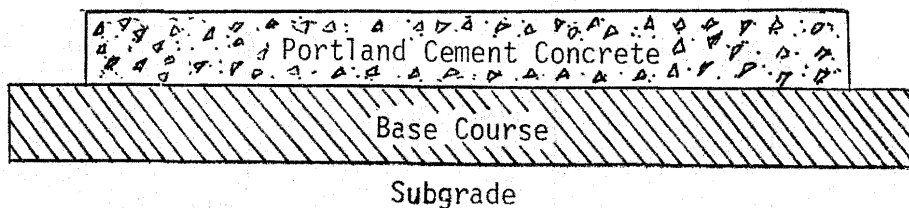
Typical Concrete Pavement Section
